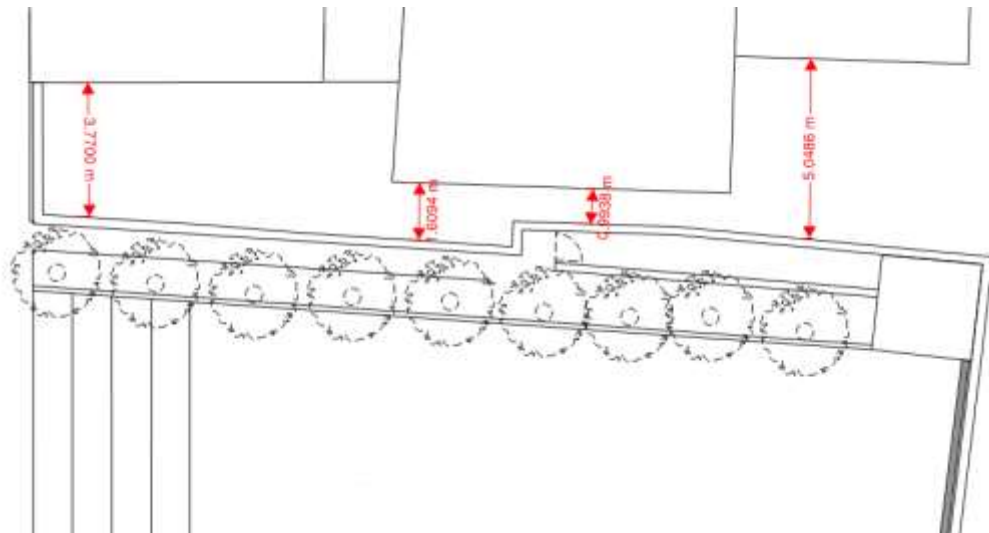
plan showing distances between site boundary and rear of Downshire Hill properties (application drawings)
